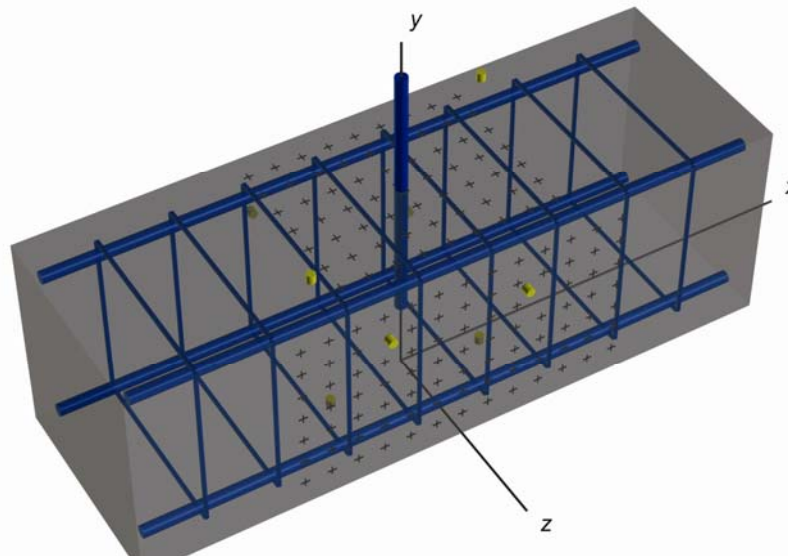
View of reinforced concrete test specimen with all PLB locations (specimen is semi-transparent to visualize embedded reinforcing bars)
